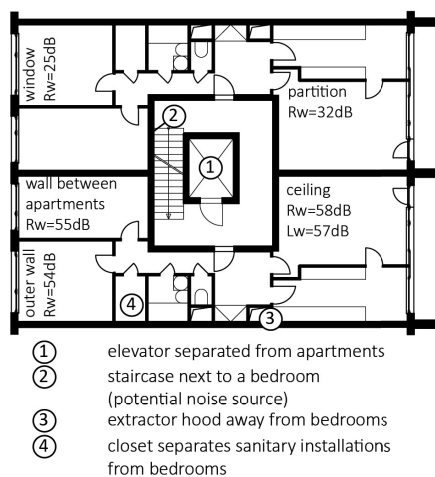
Noise sources in a section of the precast panel house (source: author)
